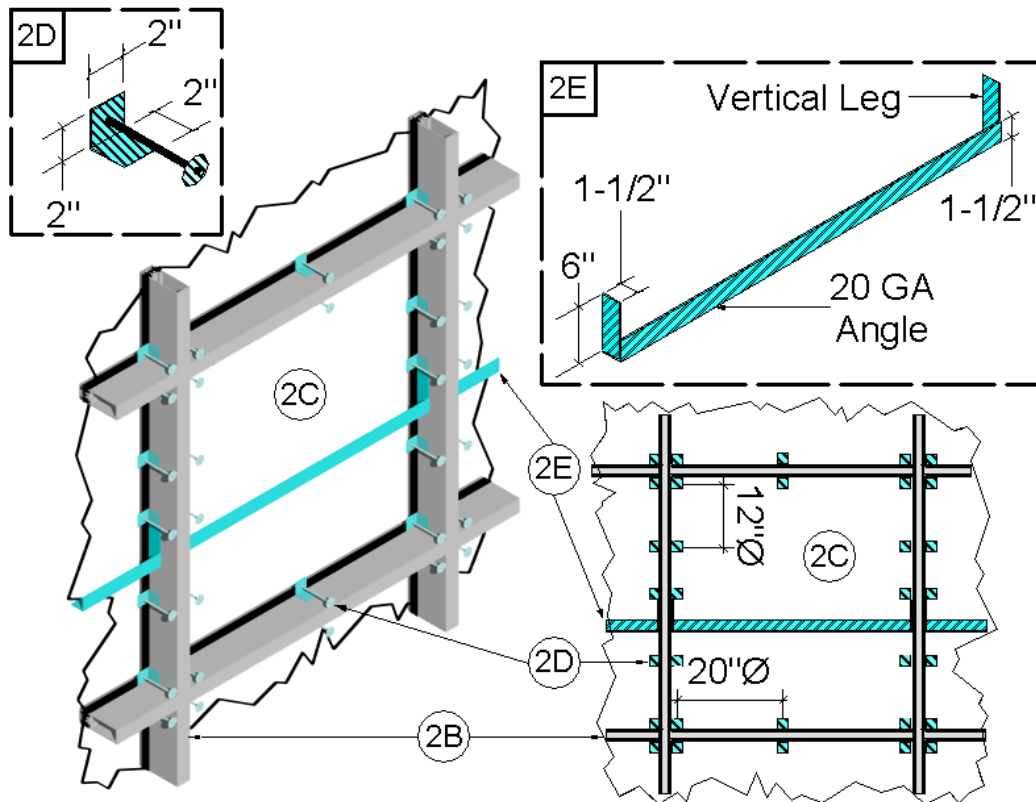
Aluminum framing isometric, aluminum framing elevation, impaling pin isometric, and reinforcement angle isometric
